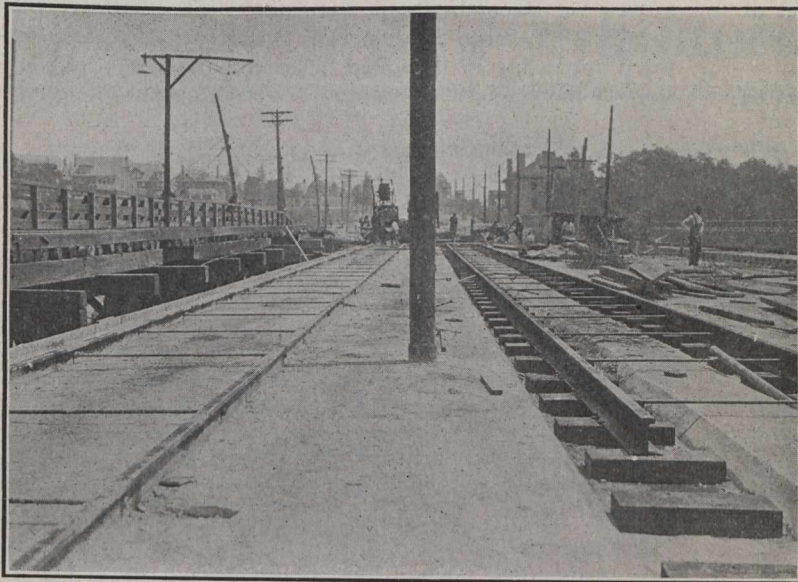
Methods of Laying Tracks on Bridge Floor.
